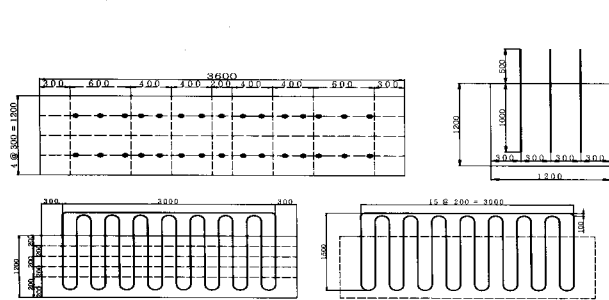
The installation form of heat pipe(turn spacing, 200mm)
